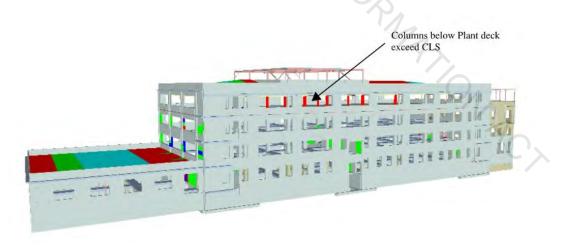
Columns Below the Third Floor - R=0.9 (70%DBE)
